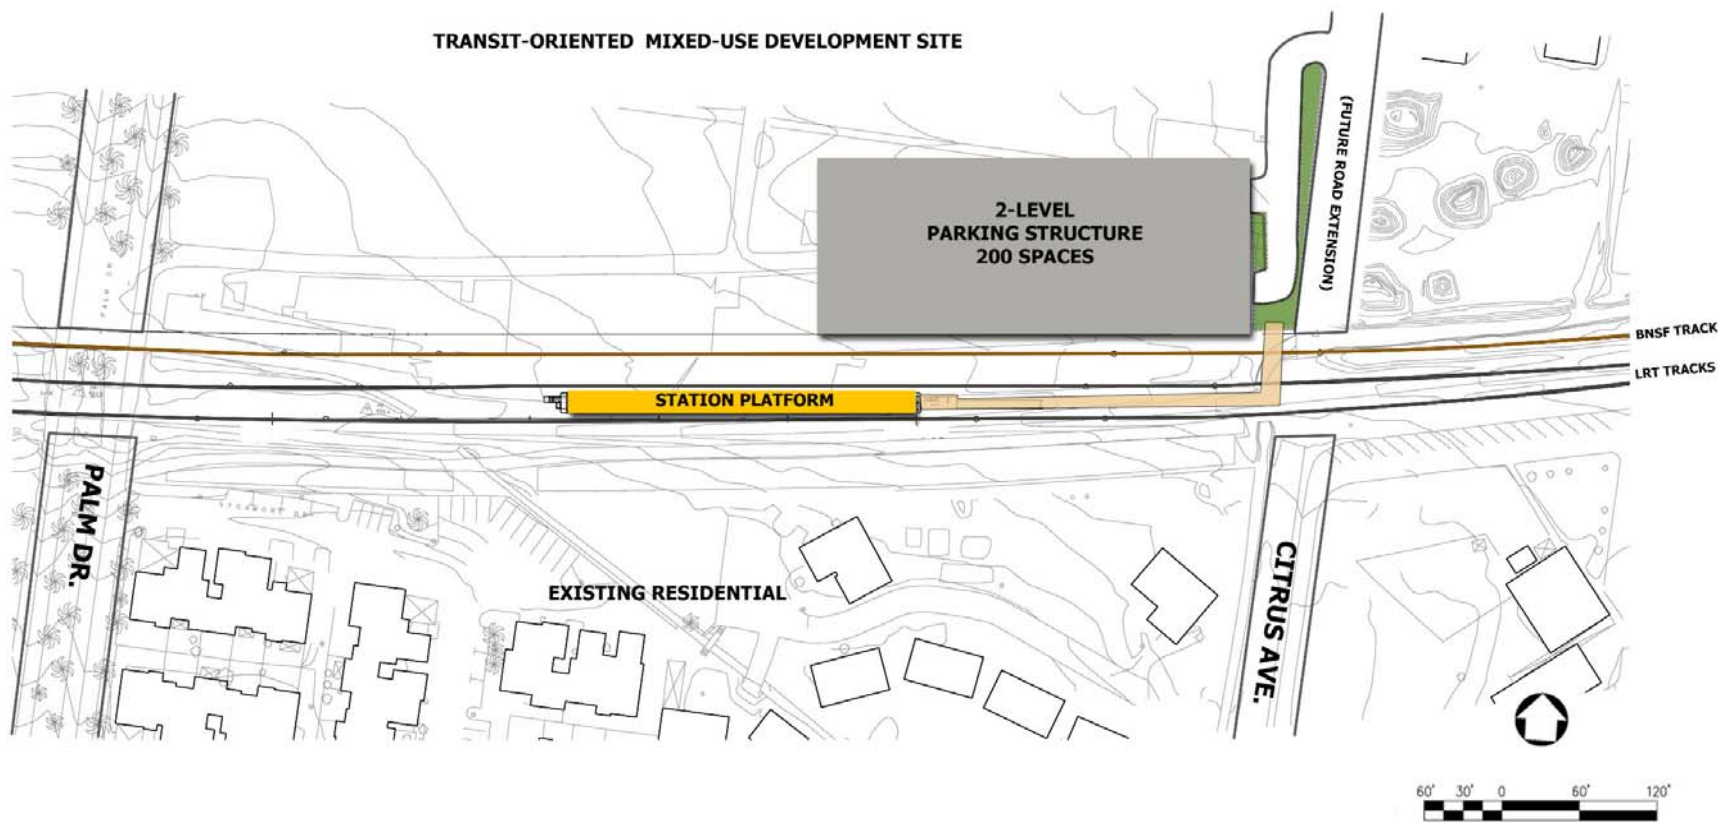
Site Plan: City of Azusa, Citrus Avenue Station
